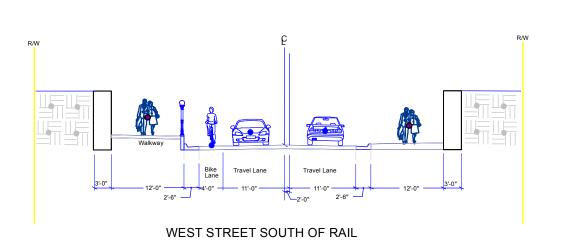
West Street Extension EA - West Street Under Railroad Typical Section
